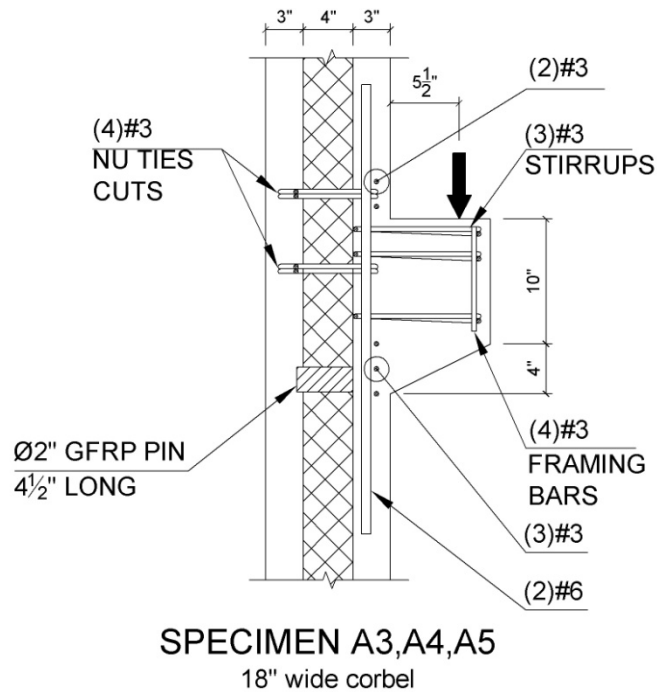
Reinforcing details of specimens A3, A4 and A5
